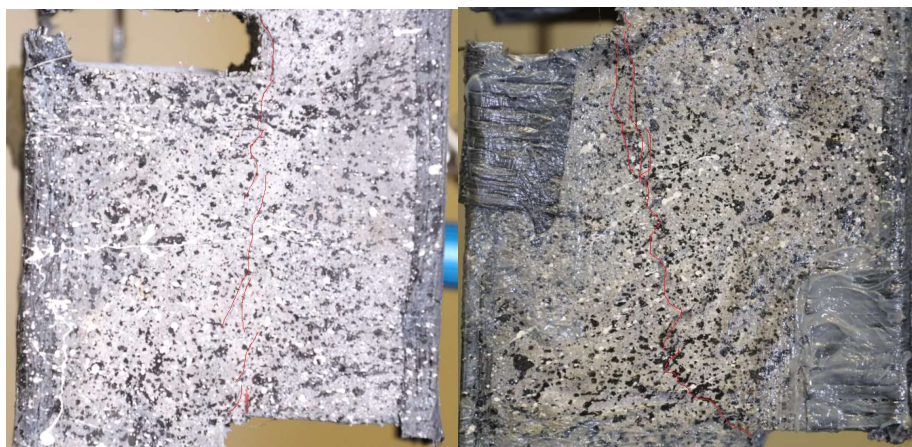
Half Scale Push-off Specimens failure cracks (SPS-S1; SCS-S1)
